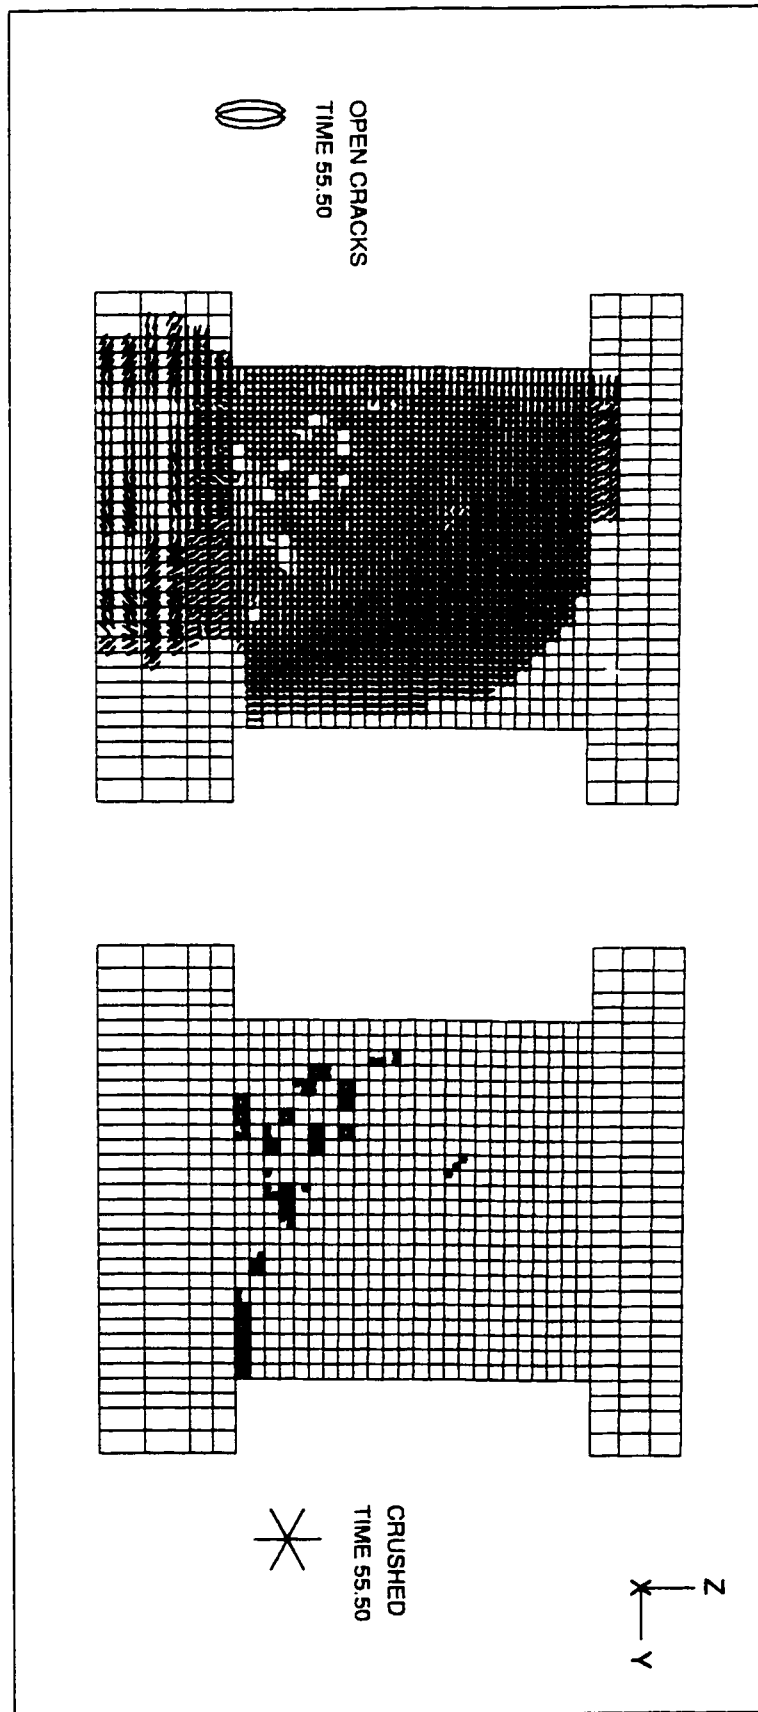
Cracking and crushing pattern of shear wall N14
